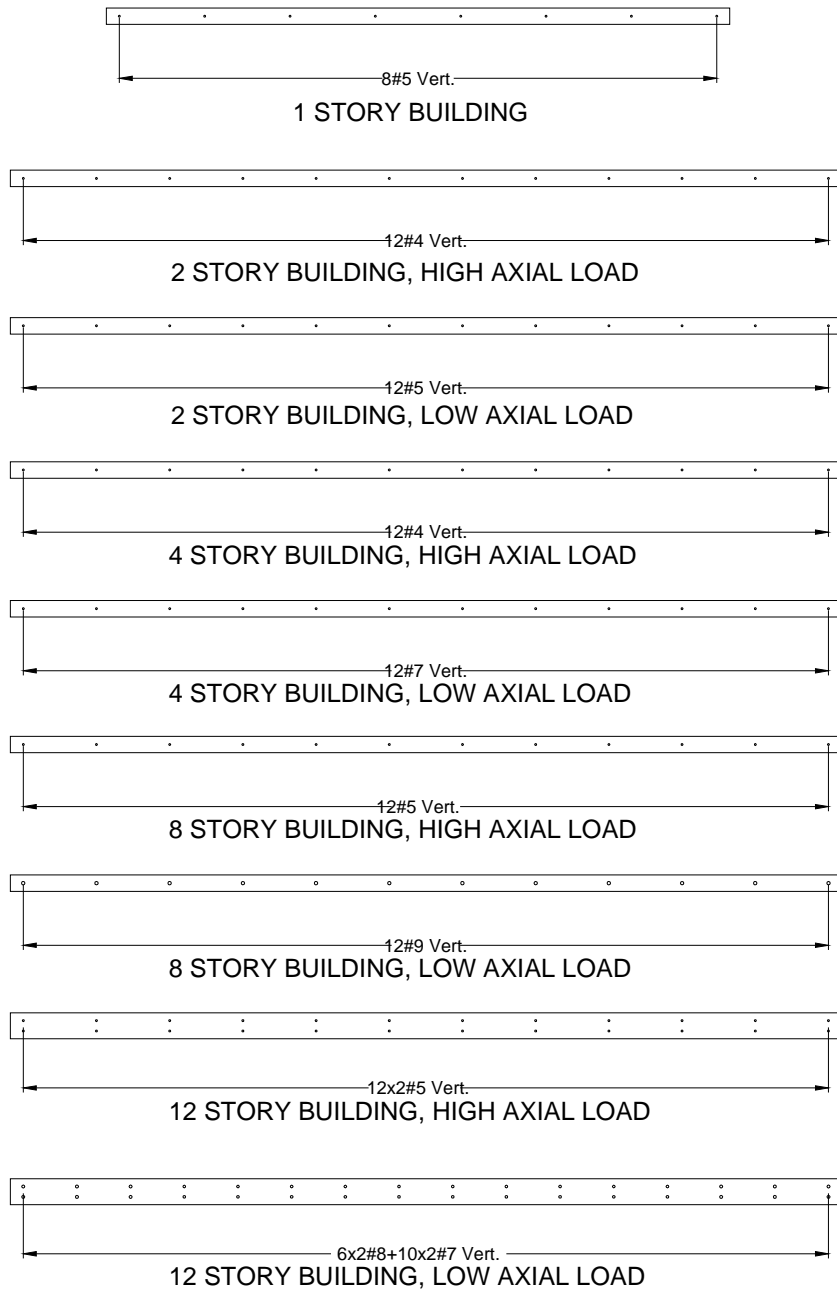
Plan sections of fully grouted special reinforced masonry shear walls, SDC D<sub>max</sub>.
